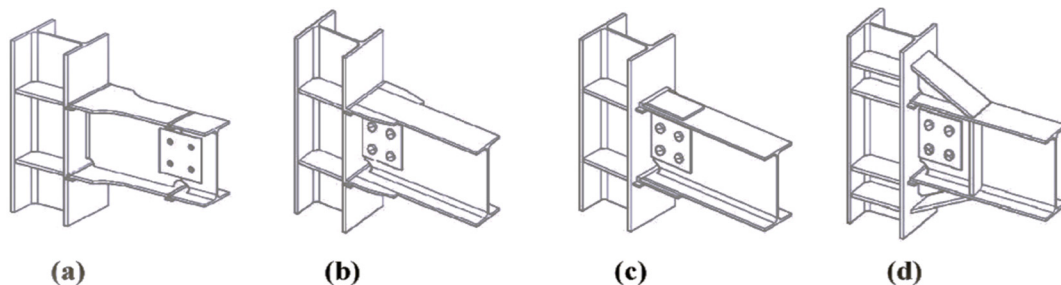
Enhanced connections. (a) Widened flange; (b) Side plate reinforced; (c) Cover reinforced; (d) Haunch reinforcement.
